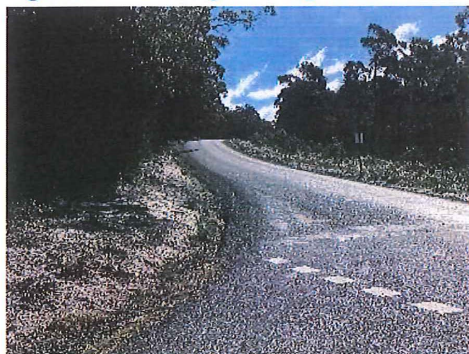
Looking right along North Ansons Bay Road from Acacia Drive.
